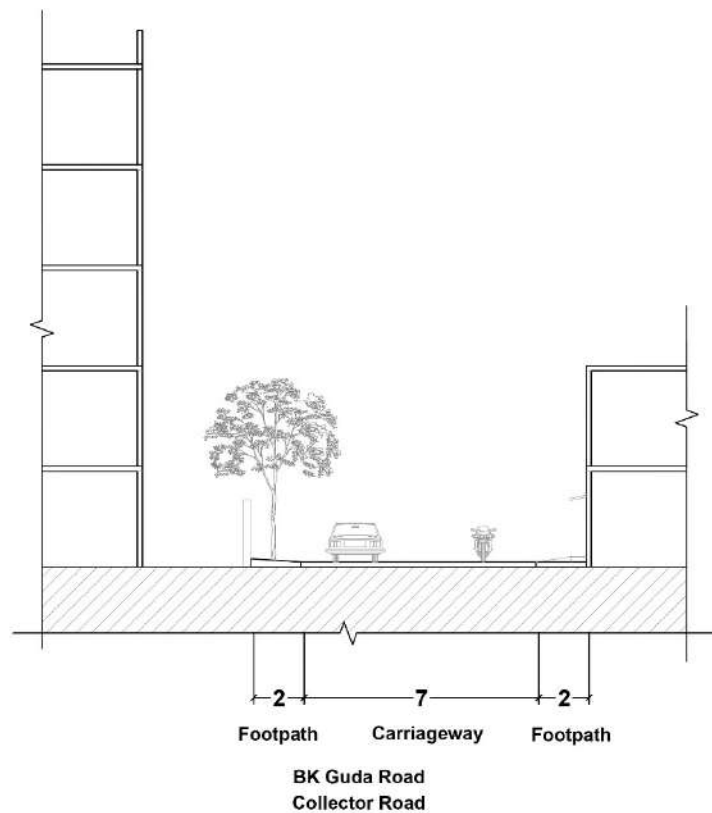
Cross section of BK Guda road near SBI Bank (E – E')
